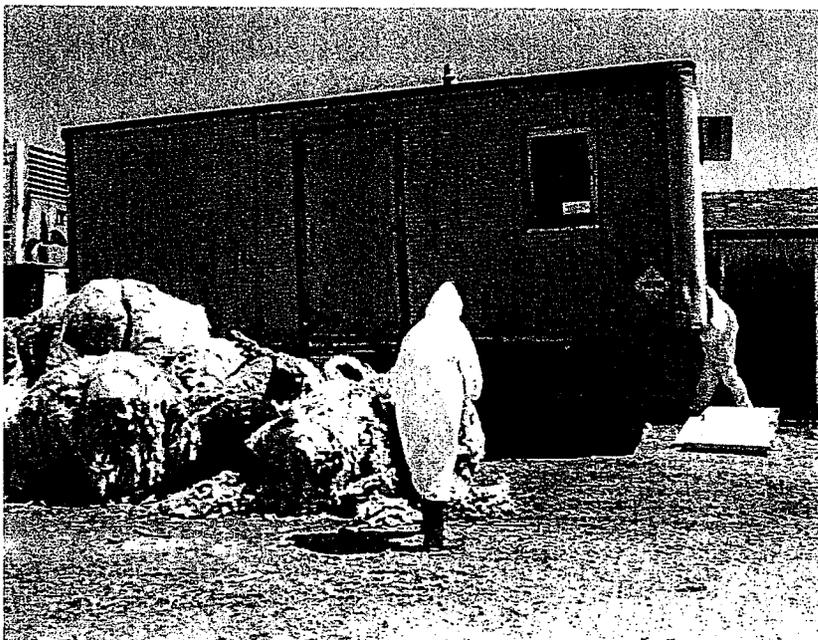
OSHA Trained Technicians collecting insulation from site
